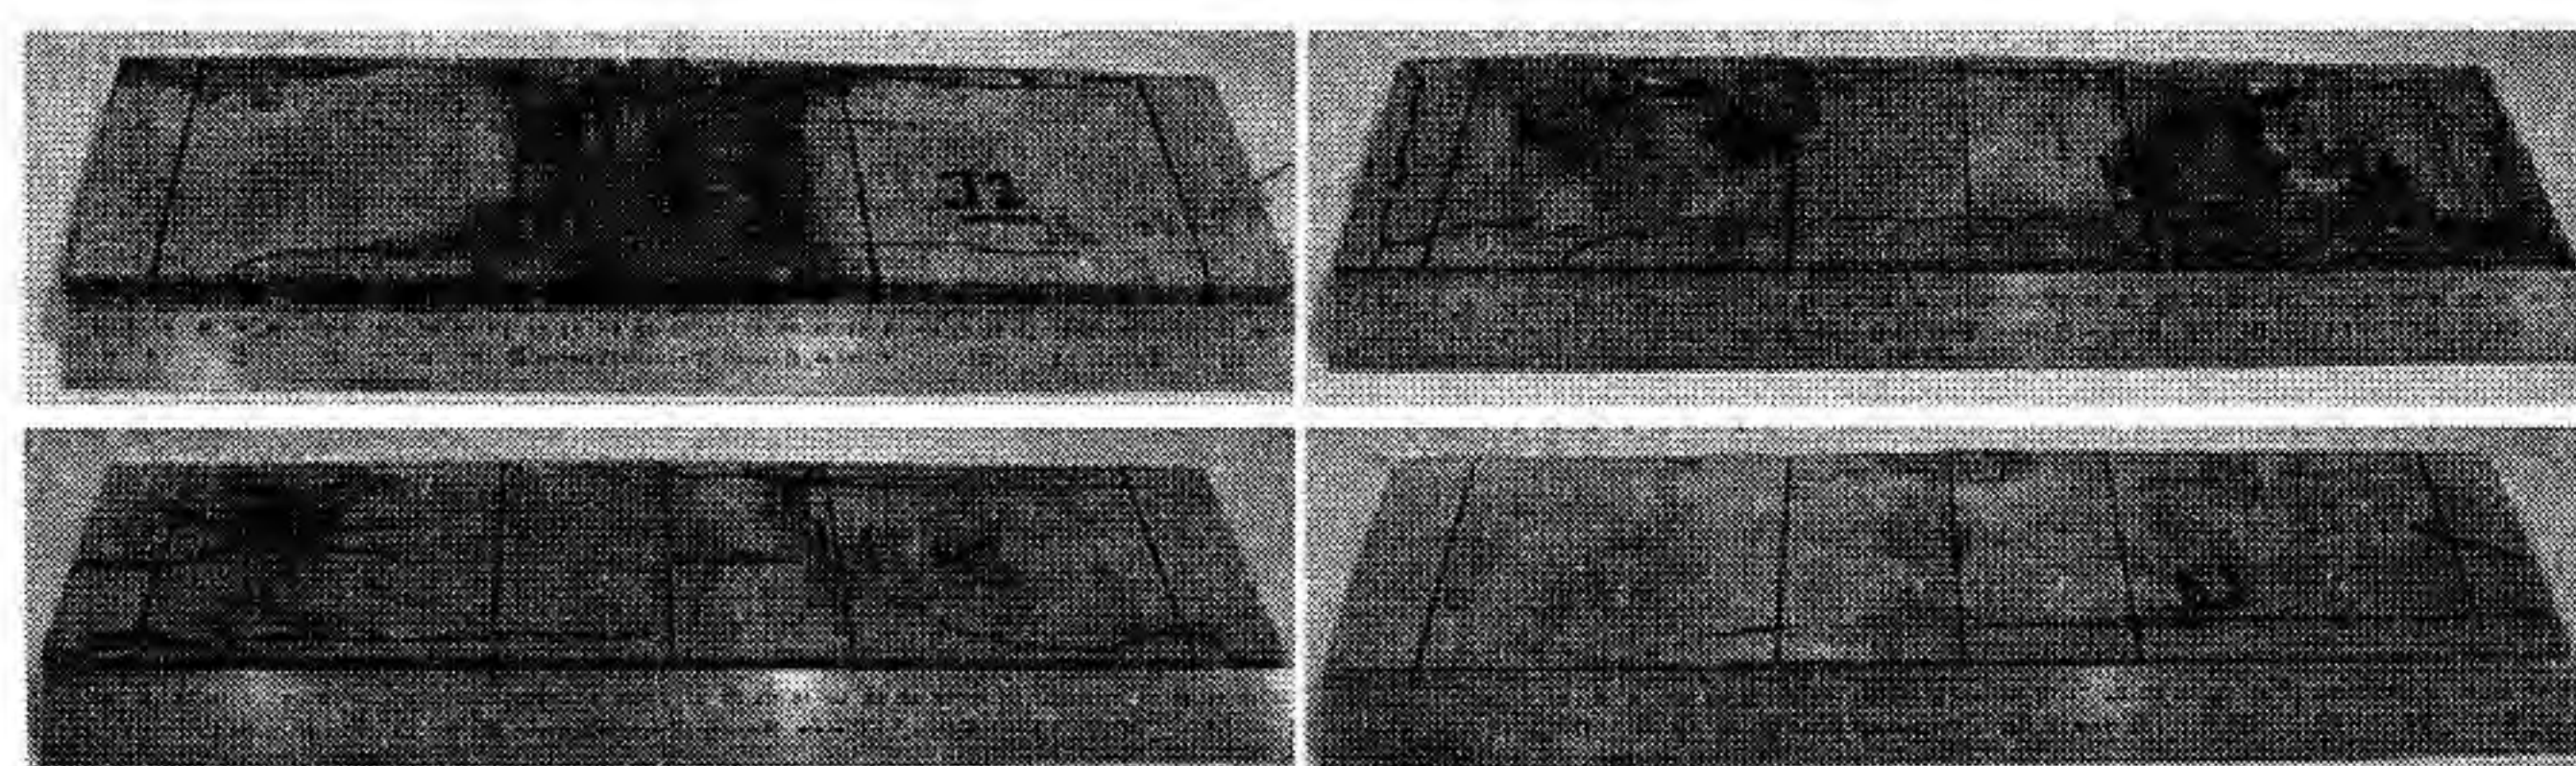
Cracking and staining in typical specimens at end of accelerated corrosion.
